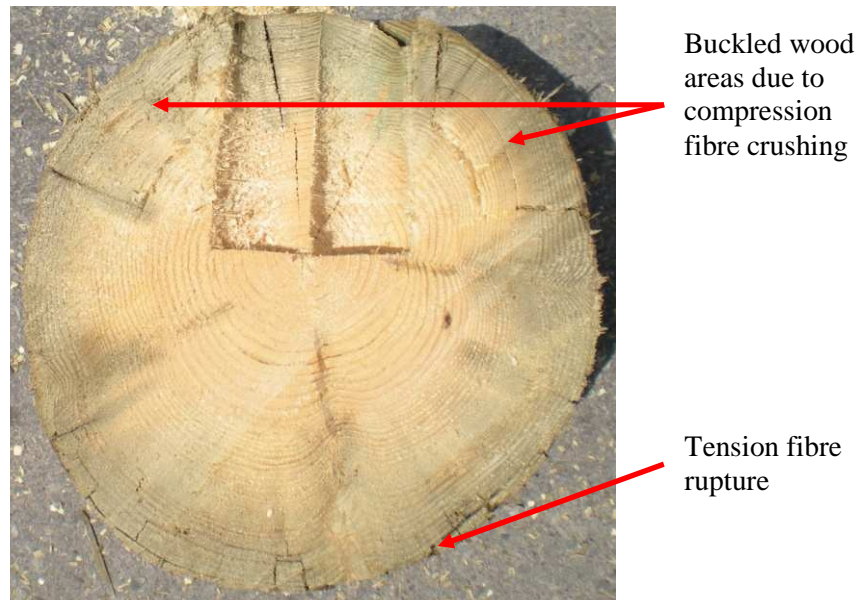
Cross-section of new pole specimen with compression feeding damage (55-1-3).
